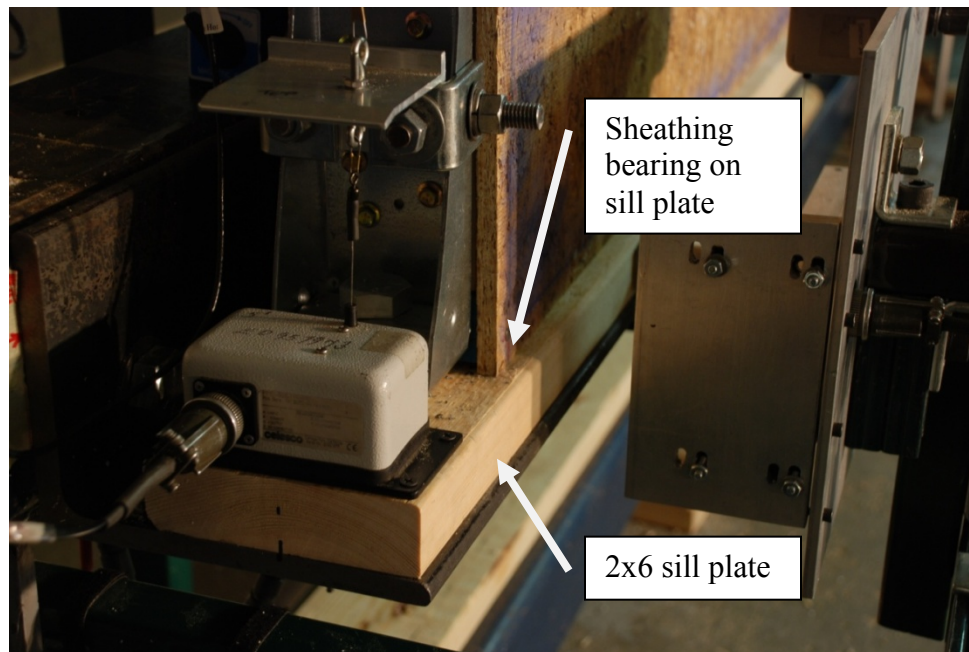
2x6 Sill plate used to create bearing on sheathing of Specimen A1Bearing-3C
